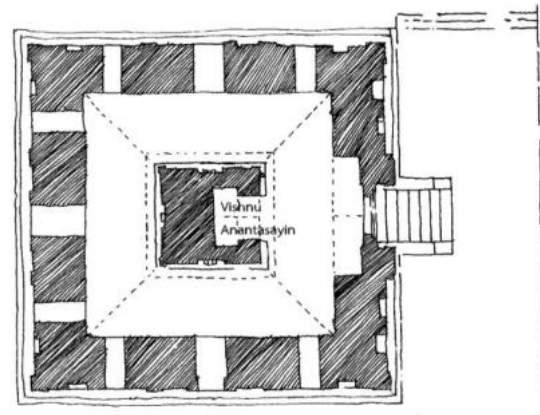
Architectural floor plan of Nat-hlaung Kyaung temple, Redrawn from Paul Strachan, *Imperial Pagan*.
